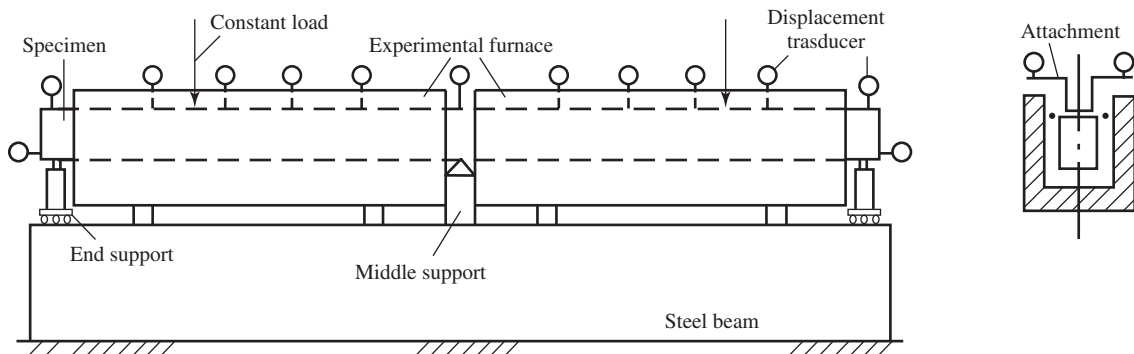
Construction and loading pattern of a frame specimen.^[11-12]
